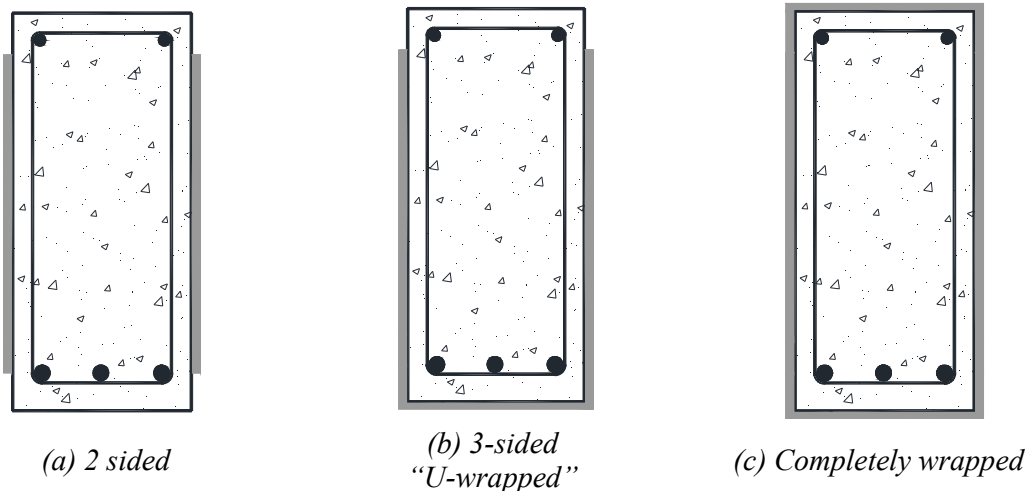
Typical wrapping schemes for shear strengthening using FRP sheets or strips (ACI Committee 440 2000)
